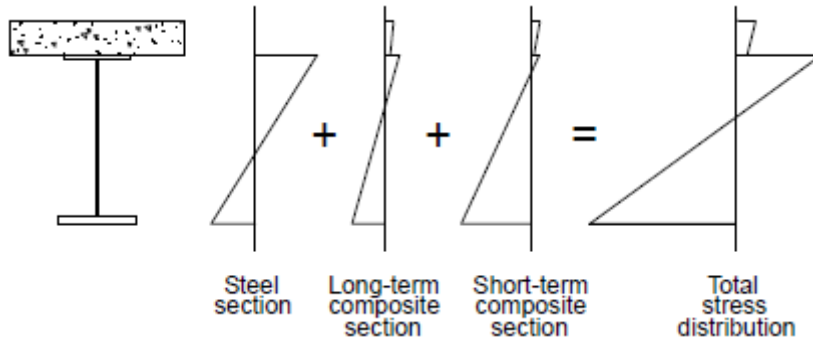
Summation of stresses acting on different resisting cross sections (Composite highway bridge design, 2010)
